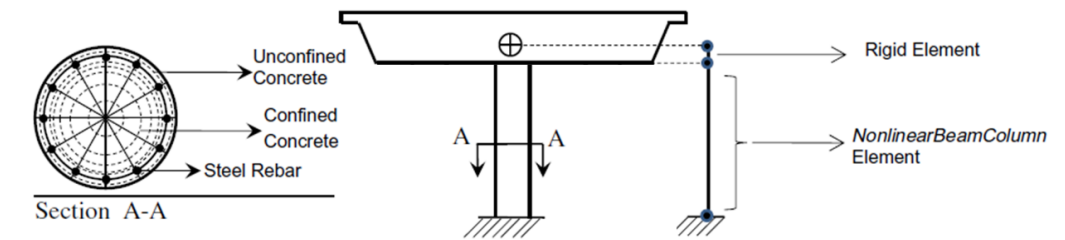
Bridge-A column FE modeling details (Kaviani et al., 2012).
